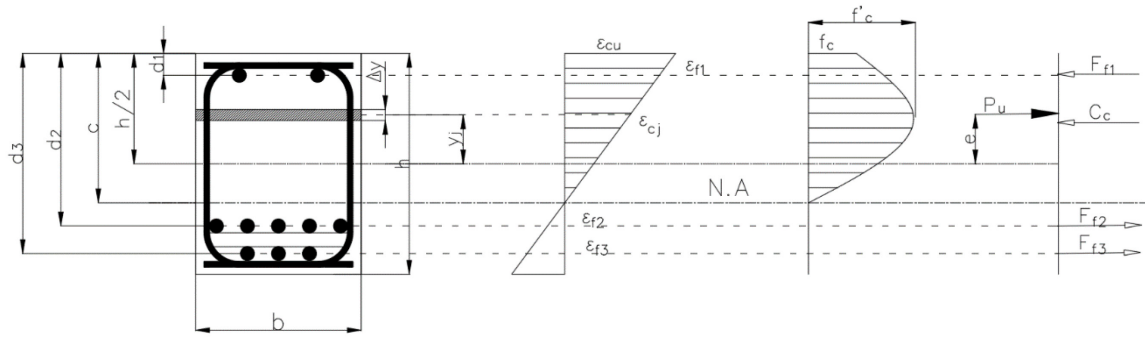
Stress and strain profile of GFRP beam cross-section
